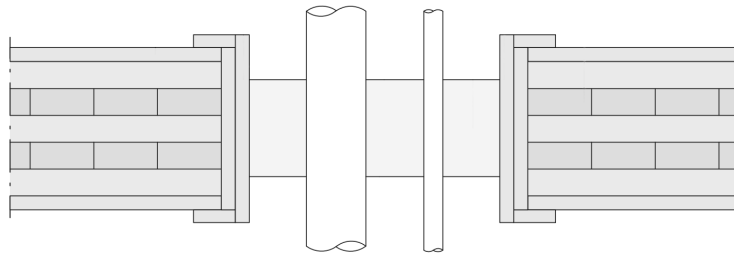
Detail showing opening in CLT floor element (Borgström and Fröbel, 2019)
